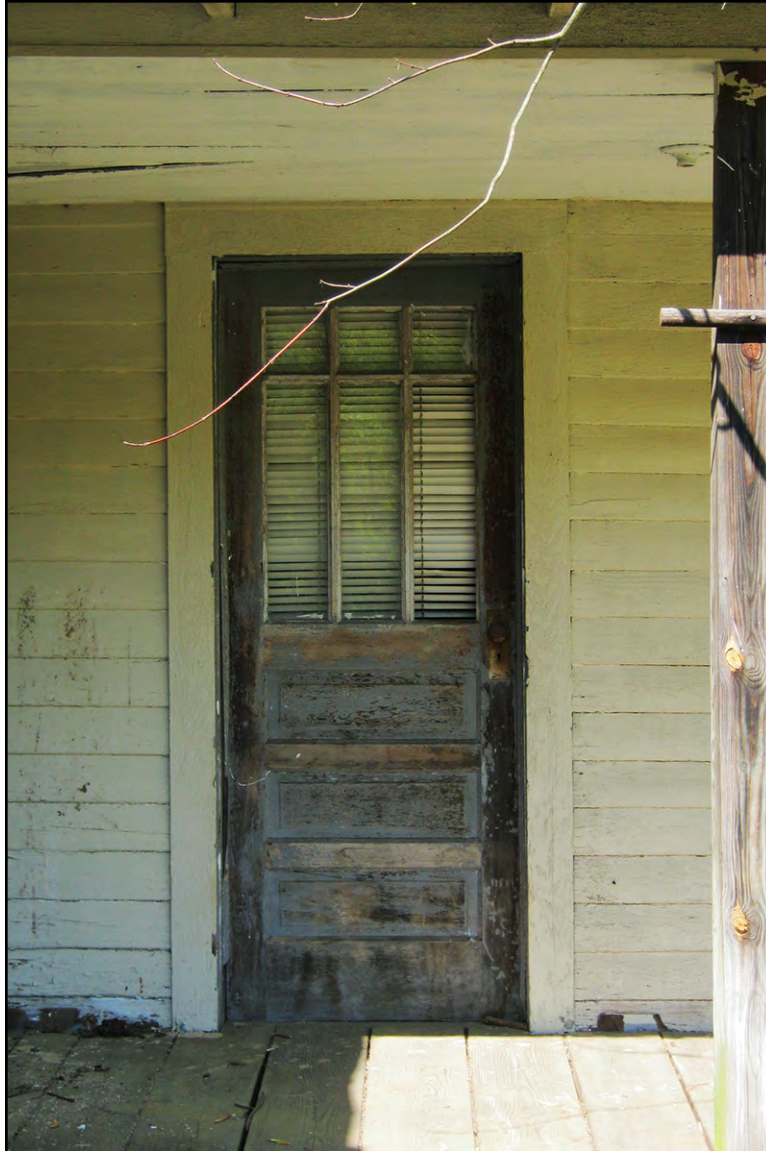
Former Gulf Gas Station (RK1128), Detail View of Typical Half-light Wood Door, Rockingham County, North Carolina
